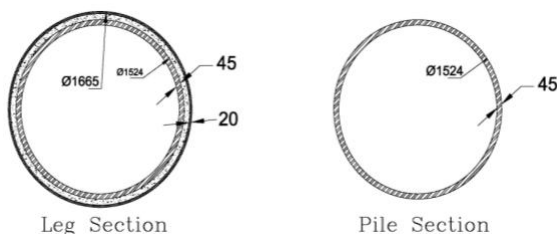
Details of Leg and Pile Section (Unit: millimeter)
